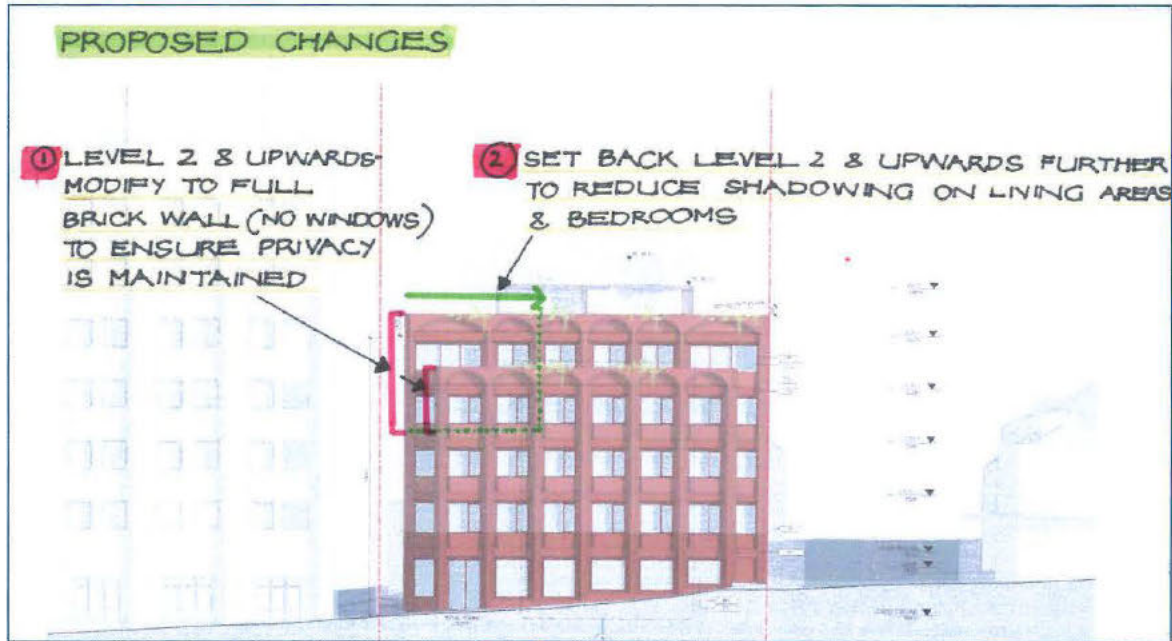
Recommendations (c) and (d) as viewed along the southern elevation.
